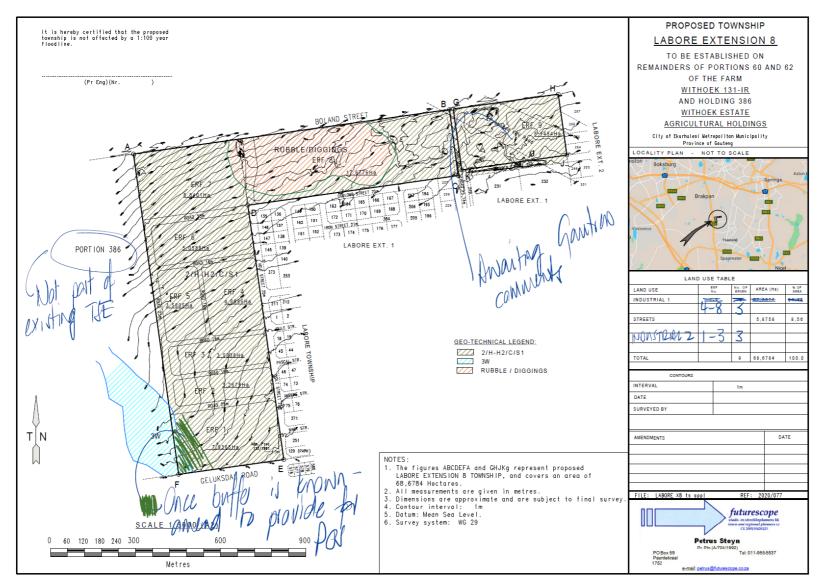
Layout Alternative 2: Revised Layout Plan with some of the recommendations from specialist and I&APs
